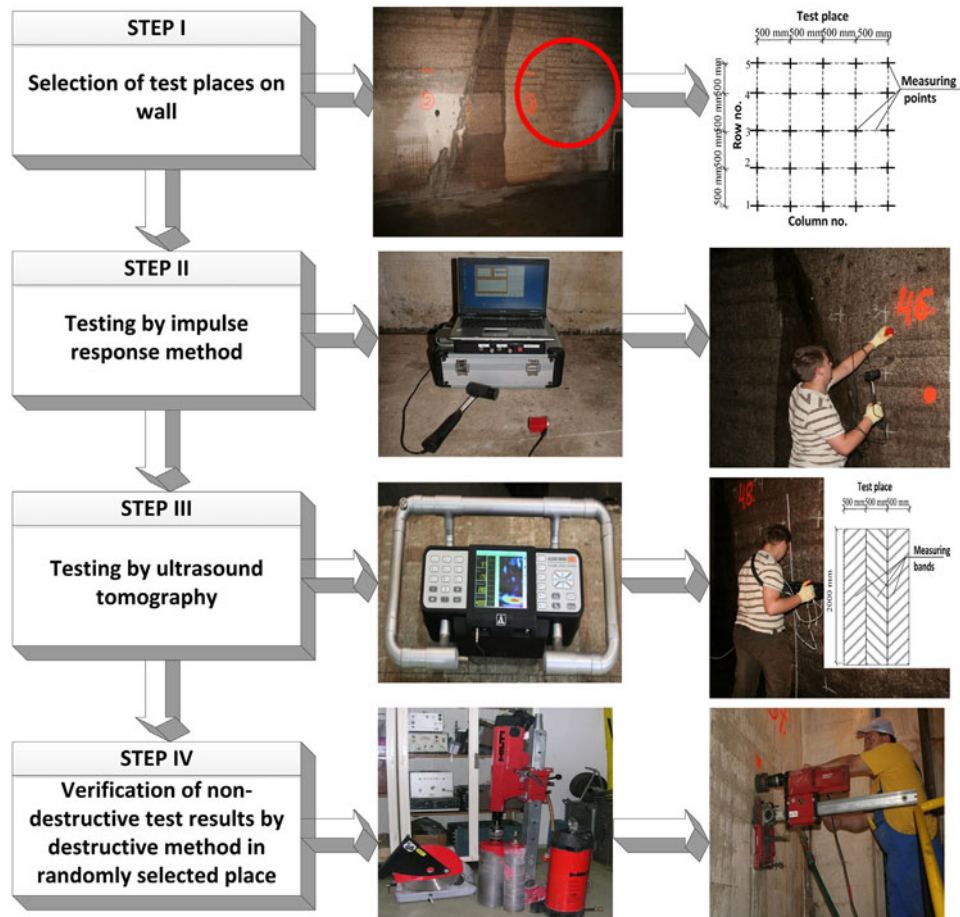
General chart illustrating methodology developed for non-destructive testing of unilaterally accessible massive concrete walls aimed at locating and identifying cracks.
